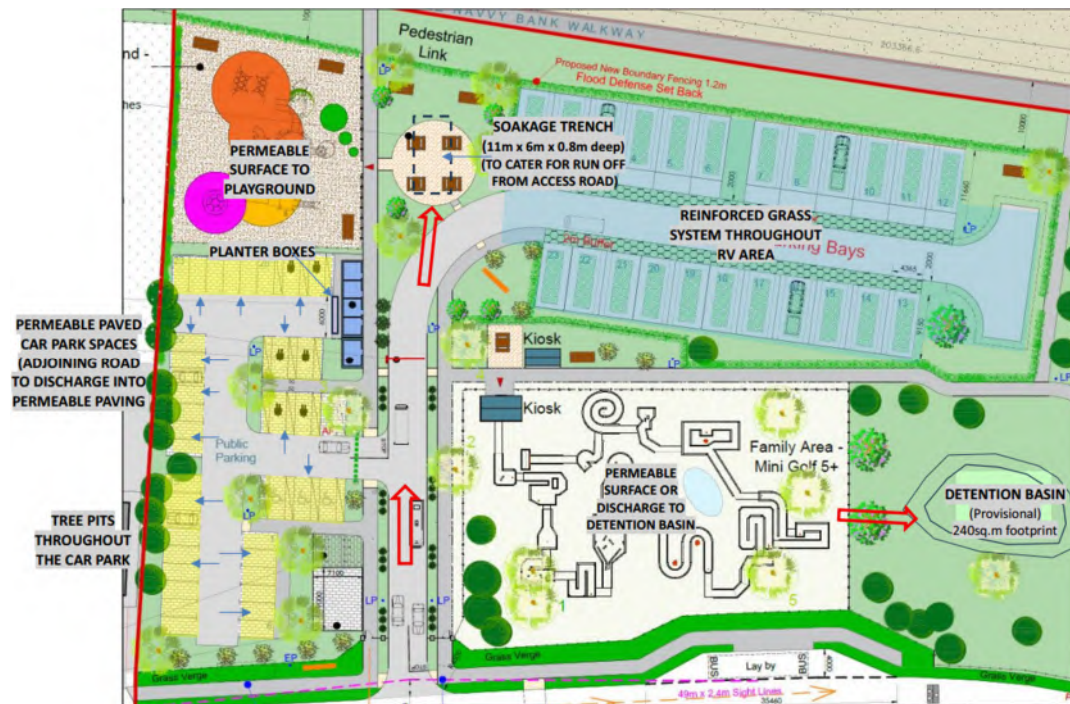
Overview of Proposed Surface Water Drainage Design for the Navy Bank Project
